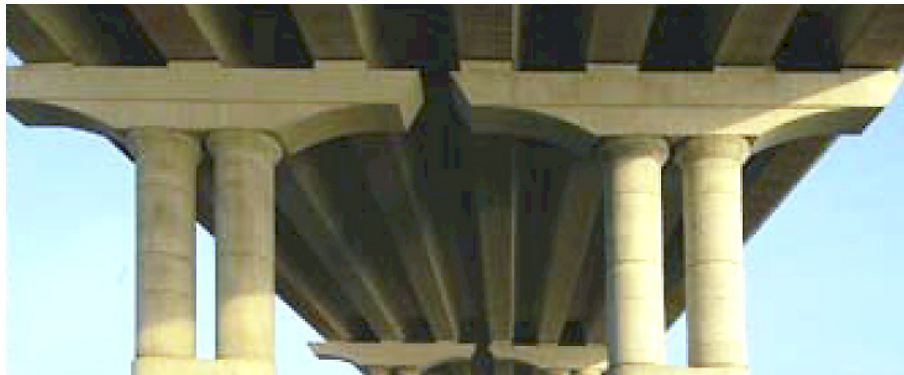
Trapezoidal bent cap (Source: Restrepo et al. 2011)
